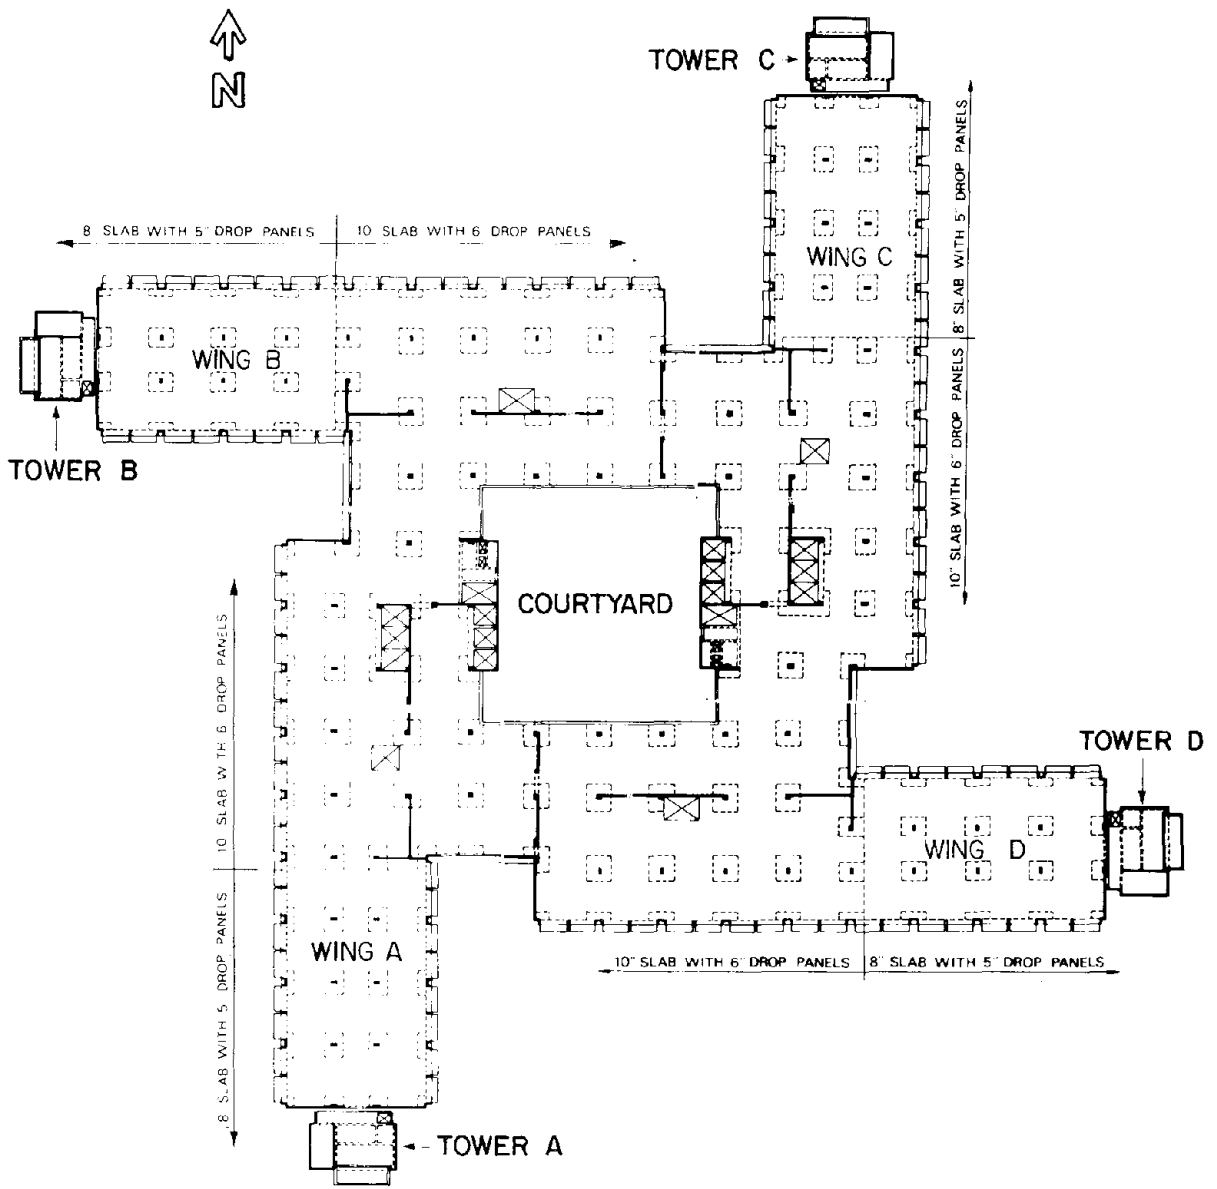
TYPICAL FLOOR PLAN ABOVE SECOND FLOOR
